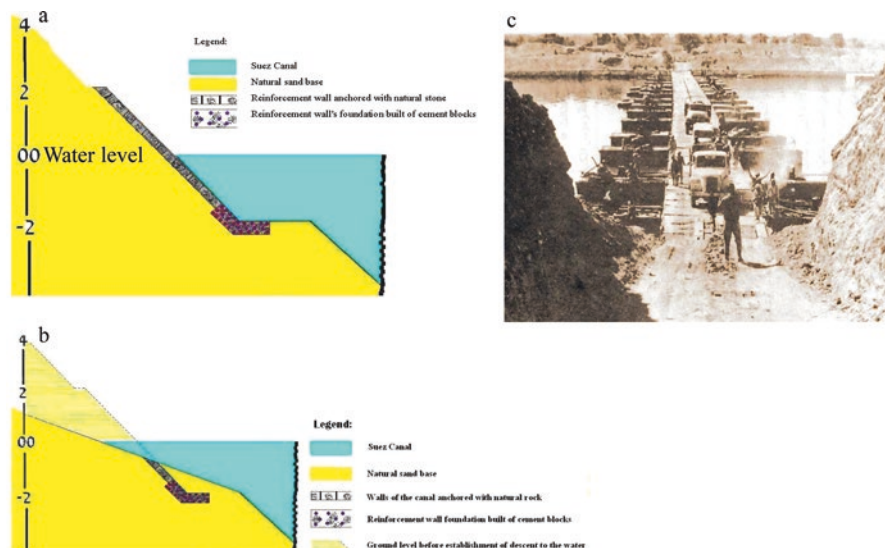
The western bank of the Suez Canal (figures after Dekel-Dolitzky 2010). (a) Reinforced slope of sand embankment with natural rock (I) and cement block reinforcements (II), (b) Modification of the west bank for military (descents to the water) access to the water line, (c) Egyptian 1973 breakthrough in the Bar-Lev Line embankment and floating bridge
